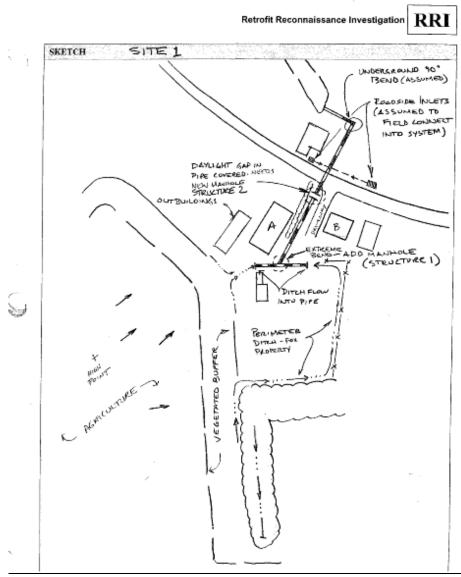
Site 1 system was sketched from field work and includes drainage inlets serving Royal Oak Road.
